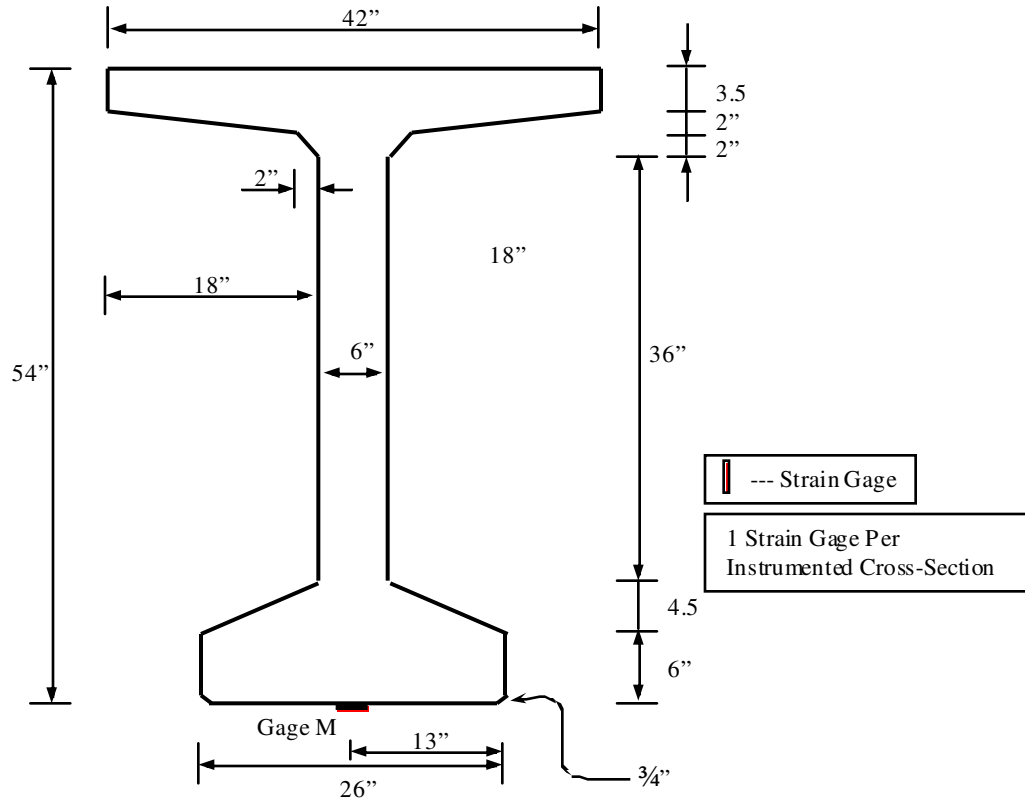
Strain Gage Layout - Span 11 Cross Sections 3, 4, 5, and 6
